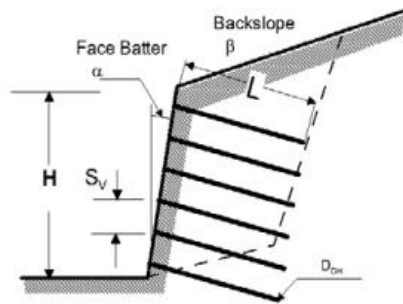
Soil nailing scheme (Mohamed, 2010)
